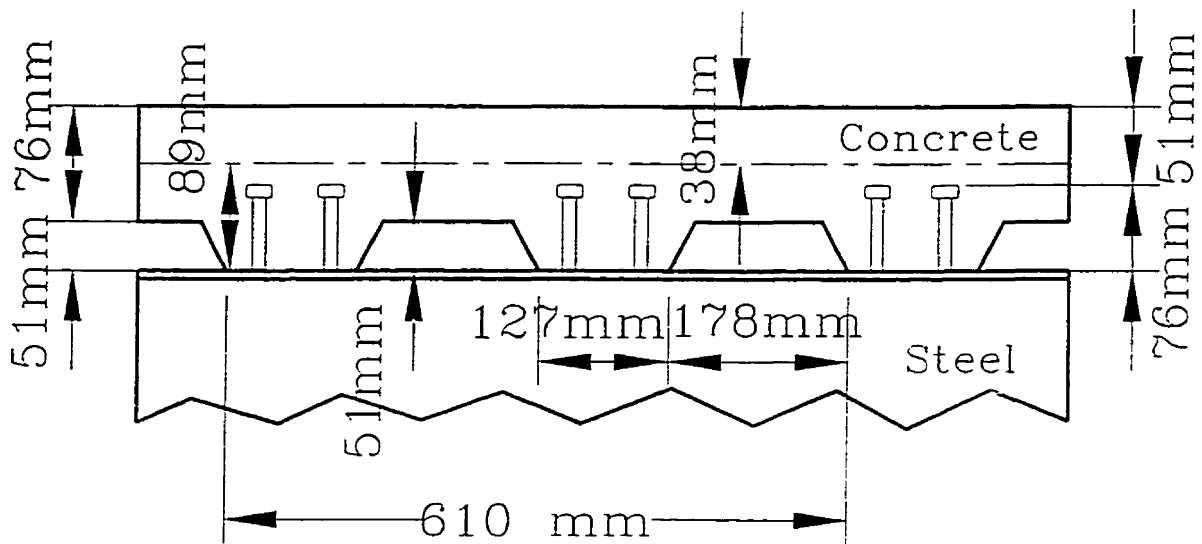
(b): Stud connection between top steel flange and concrete slab N.A.
